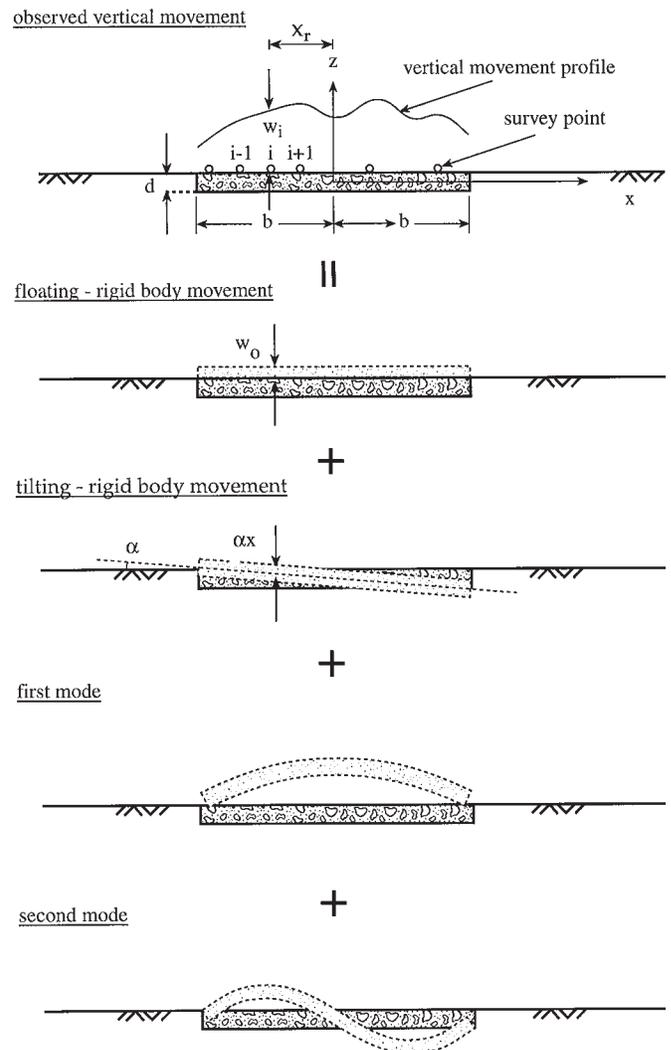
Components of vertical movement for a typical sidewalk slab.
